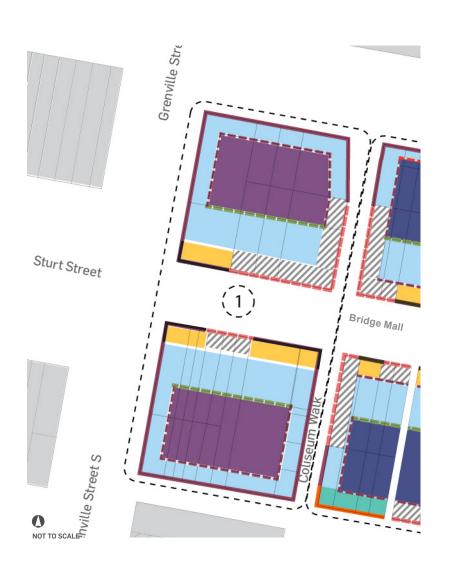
Built Form Framework Plan for Sub-Area 1: Bridge Mall Gateway
